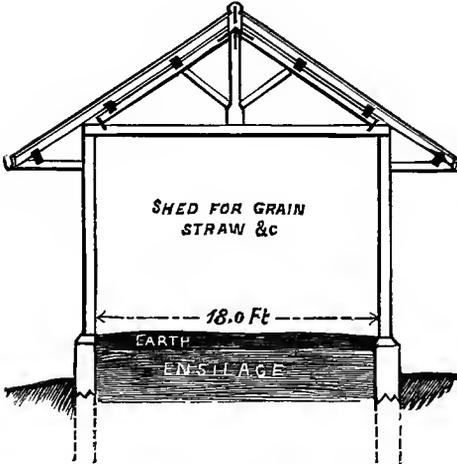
Transverse section of M. de Chezelles's "Grange Silo."¹
